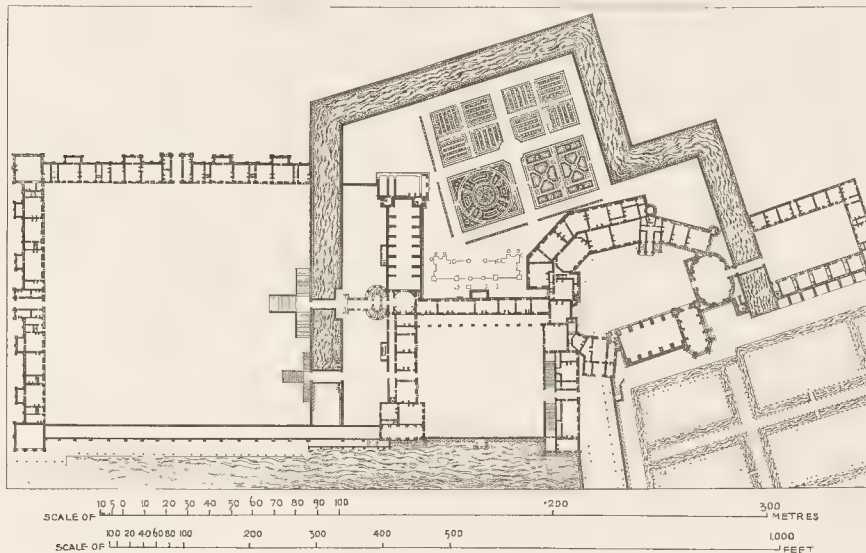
FONTAINEBLEAU. PLAN IN 1579.
